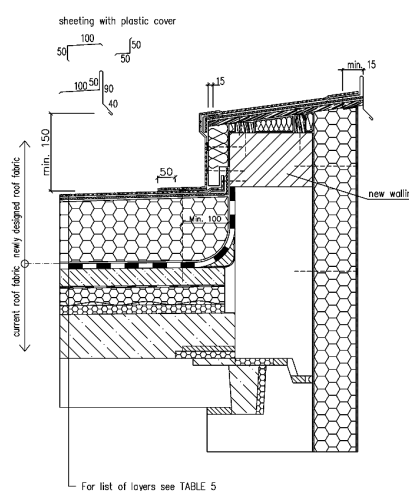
Detail of insulated attic gable – alternative with PVC-P waterproof insulation
